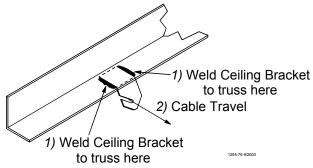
Welded Steel Truss Ceiling Bracket Installation
